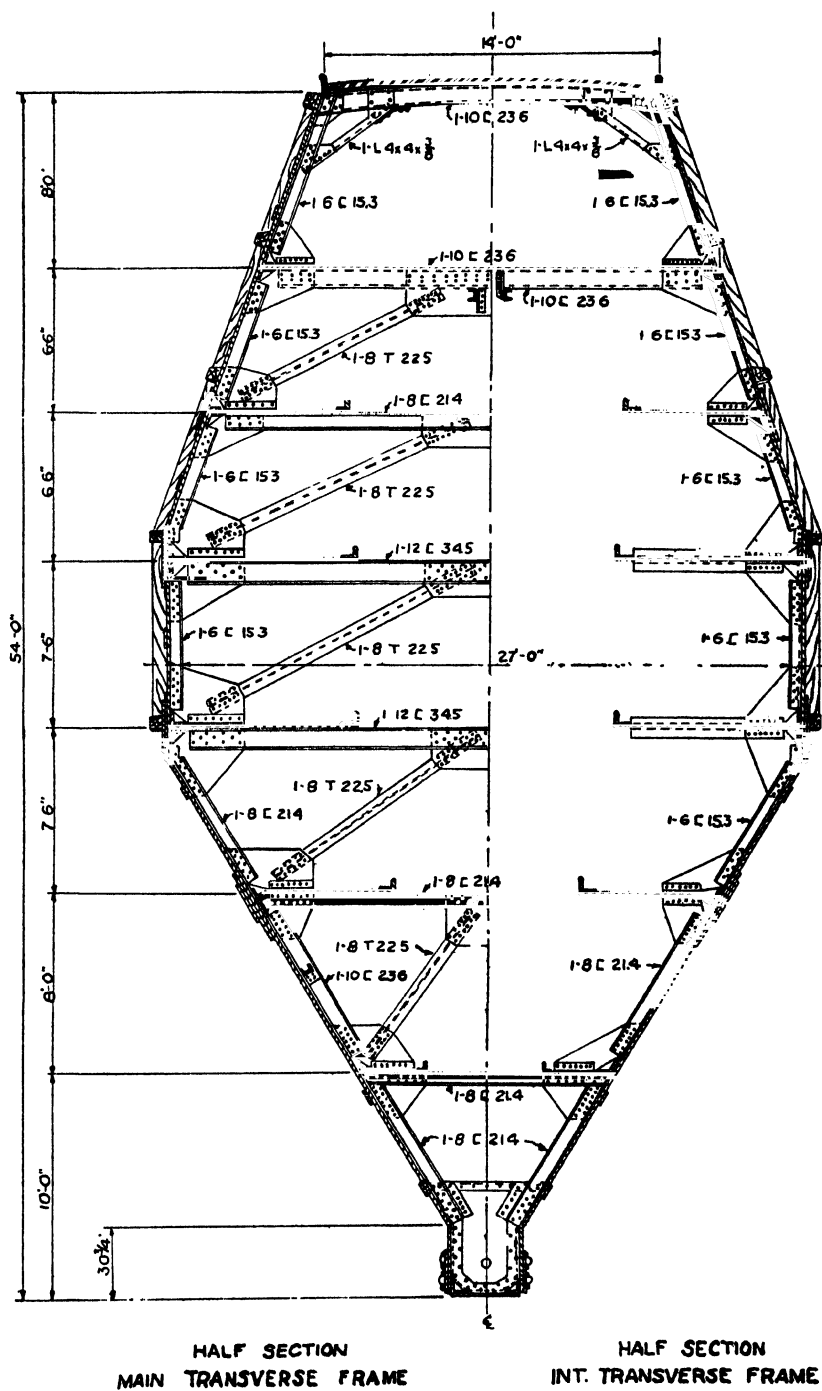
Cross-section of a conventionally-designed riveted culason, showing typical transverse framing.
